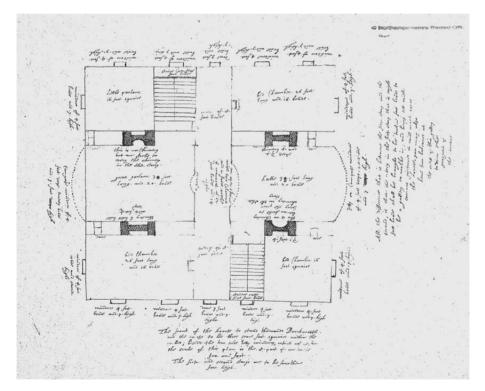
Lamport Hall. Papillon's plan for a new house (Northamptonshire County Record Office, IL30799 A47).
